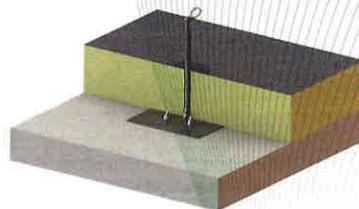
4: Anchor device type REEX (assembly examples)
